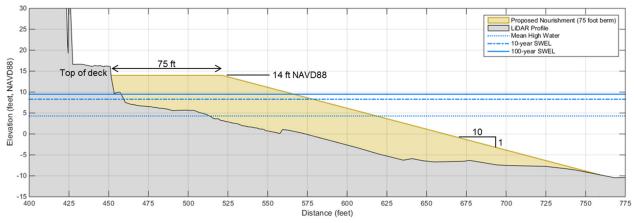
Proposed beach nourishment template featuring a 75-foot berm at an elevation of 14 feet NAVD88 and a beach slope of 1V:10H.
